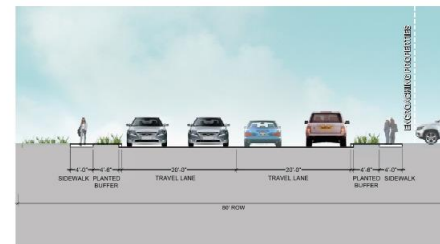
Existing Collector Conditions - Dixie Drive from Mykawa Road to Telephone Road
